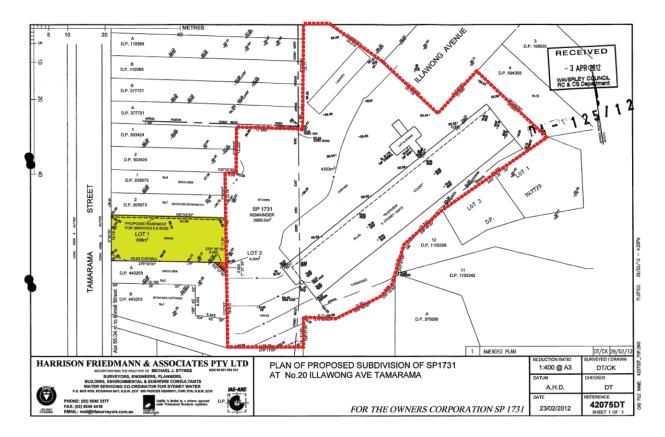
Proposed Subdivision Plan Lots 1, 2 and 3 of 20 Illawong Avenue.
